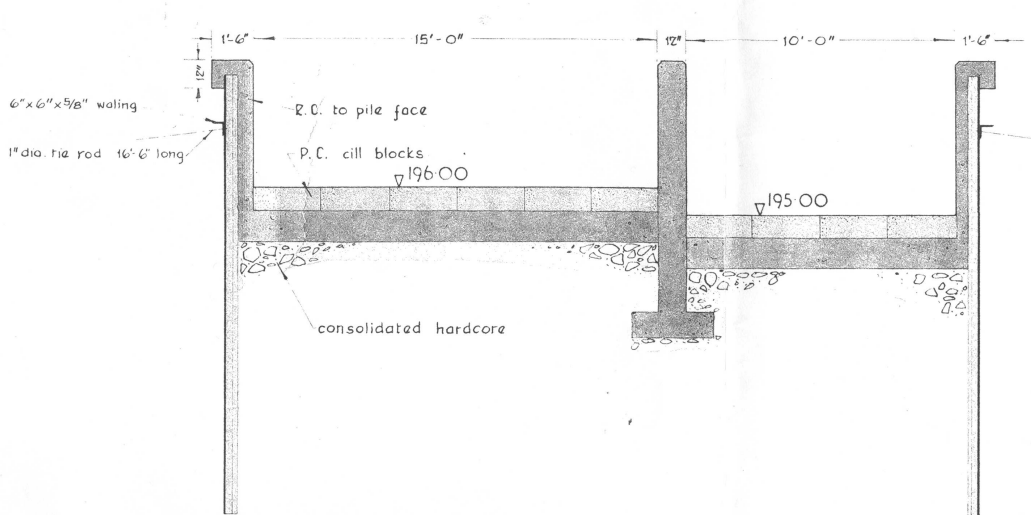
Brimpton weir: Cross-section (adapted from the original Environment Agency (1966) construction drawing)
